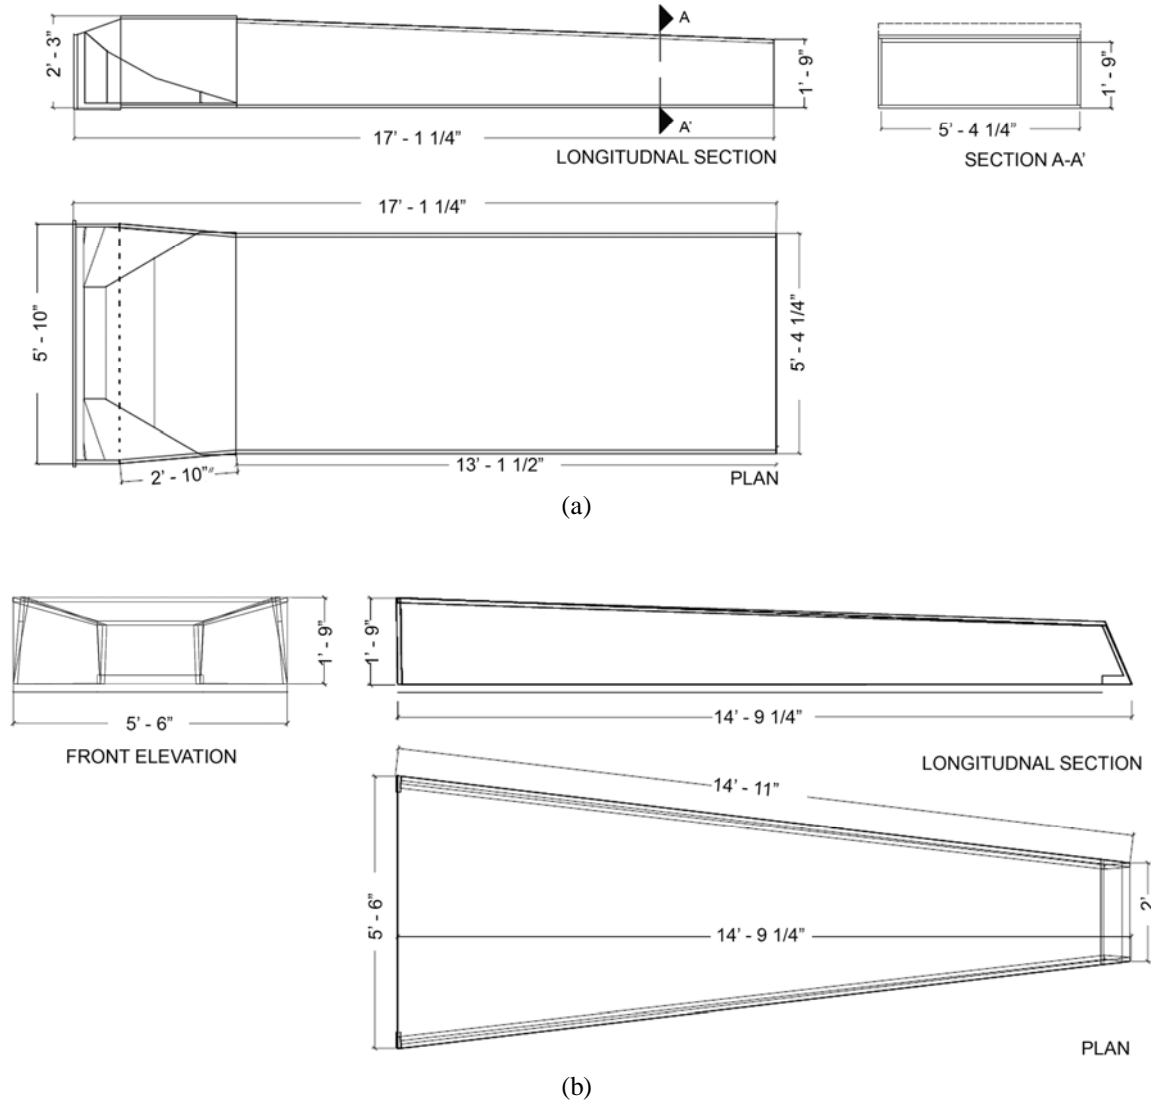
Dimensions of OLIP in full scale. (a). Plan and sections of front transport section, (b) plans, section and elevation of back transport-section and diffuser.
